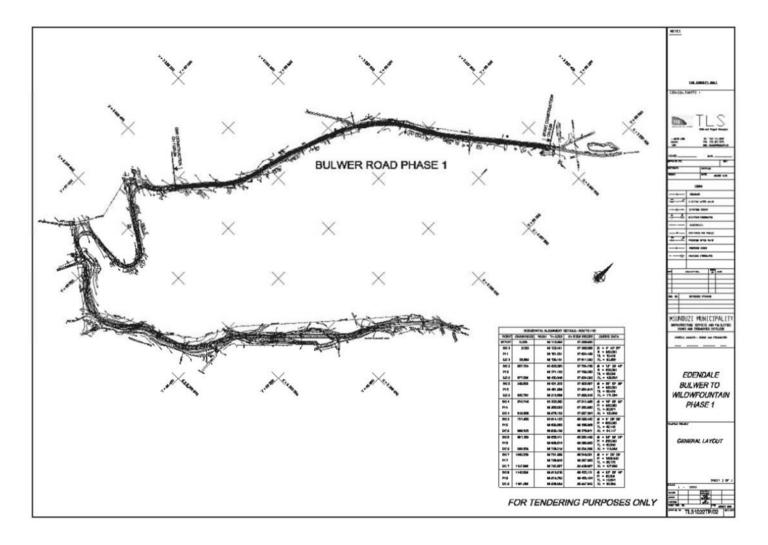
Msunduzi Municipality Willowfountain Road Upgrade project – Layout Plan
